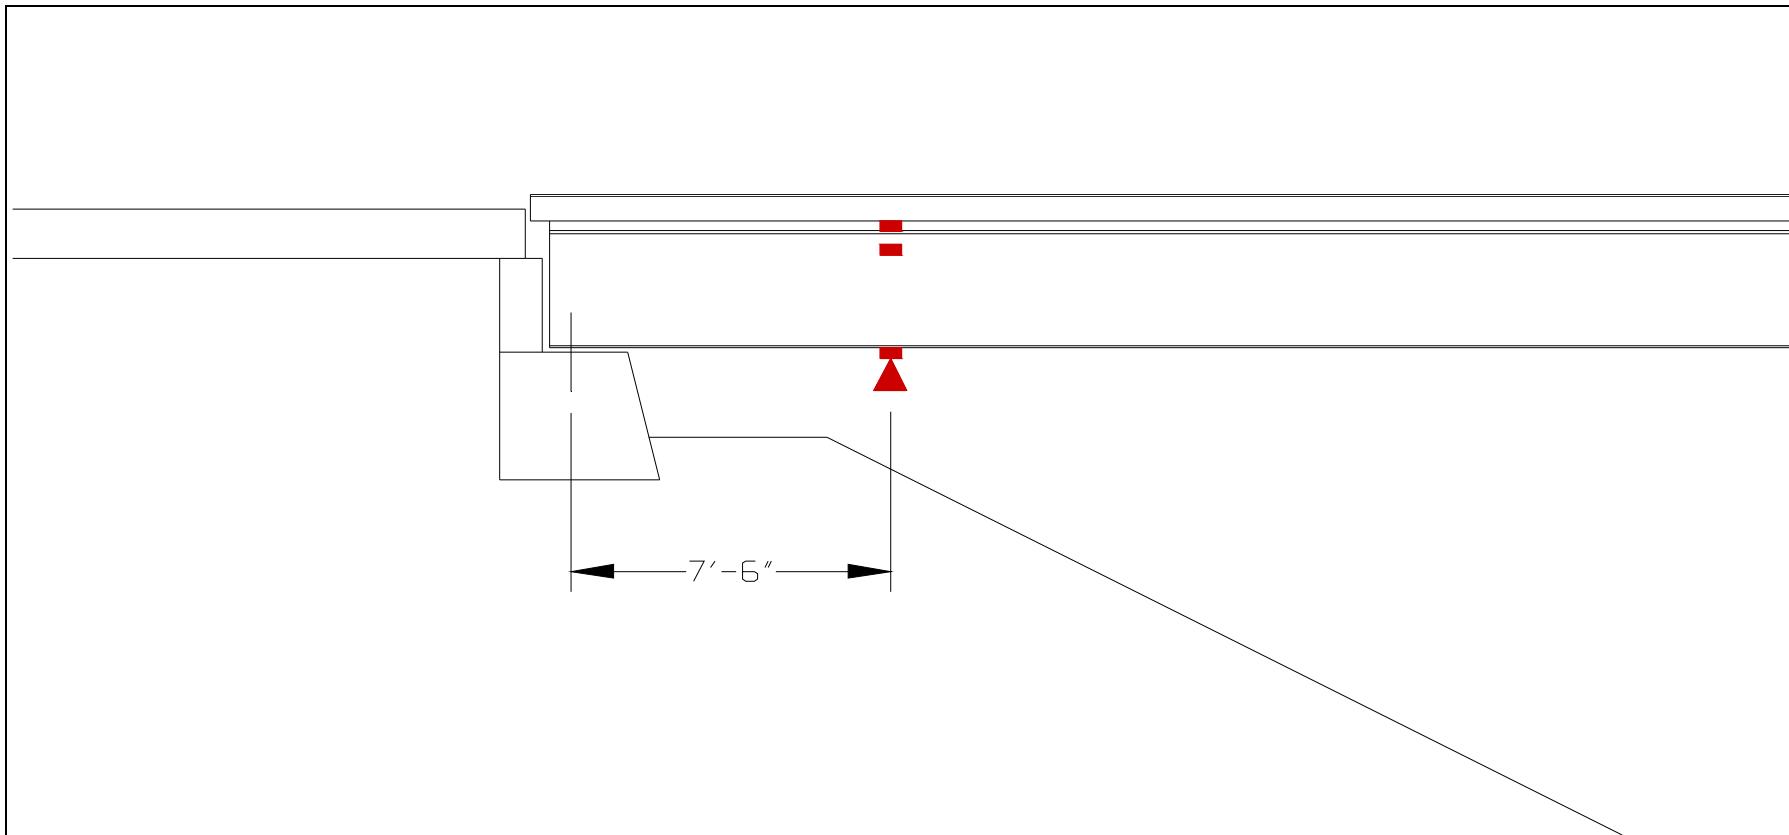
Typical FRP deck instrumentation between beams.
